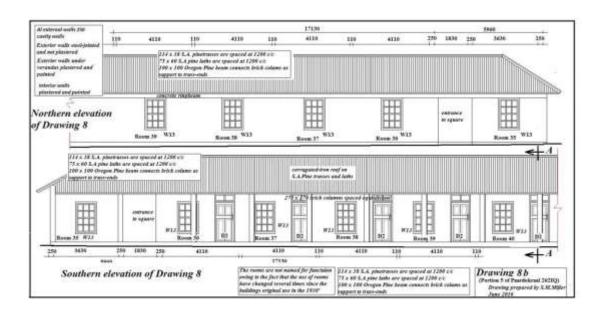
Above. Northern and Southern elevations of the building captured in Drawing 8. (*Drawing S.M. Miller 2016.*)
